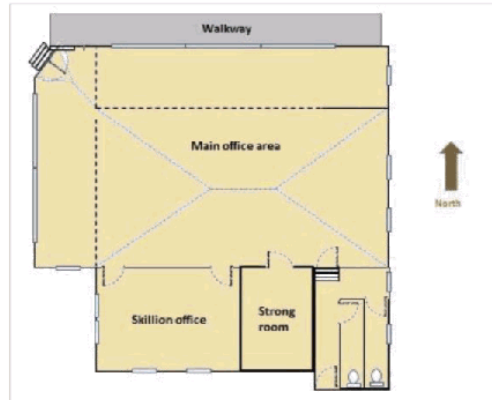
Internal floor plan (AHS 2016) [dotted lines show removed verandah walls]
